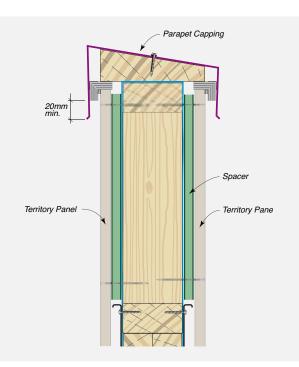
Two Sided Parapet Wall Junction - Plan View
